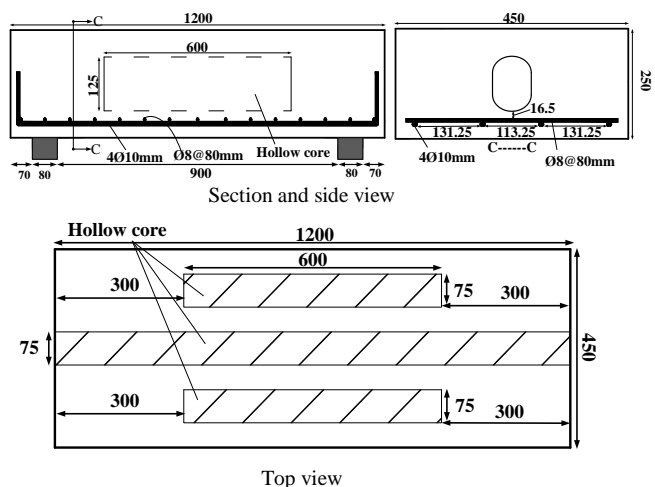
HCS Specimen (HCS-250-C) (All Dimensions in mm)
